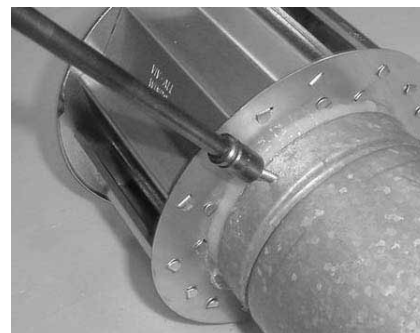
Attaching Double-Wall (Type B) Vent Pipe to the Heater
